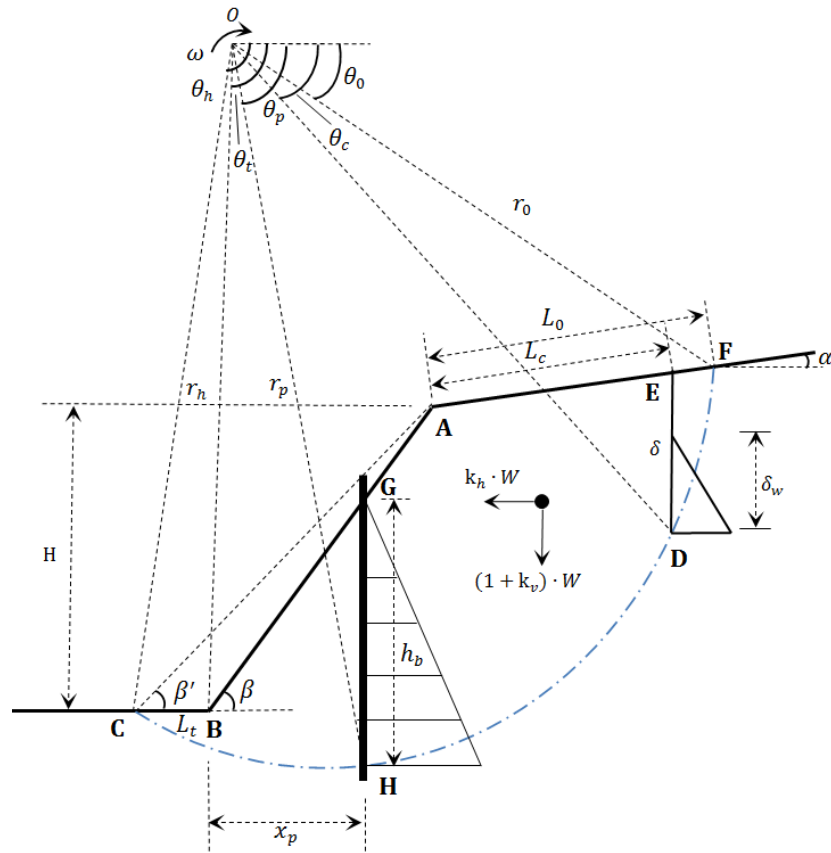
Failure mechanism for cracked slope reinforced with piles.
